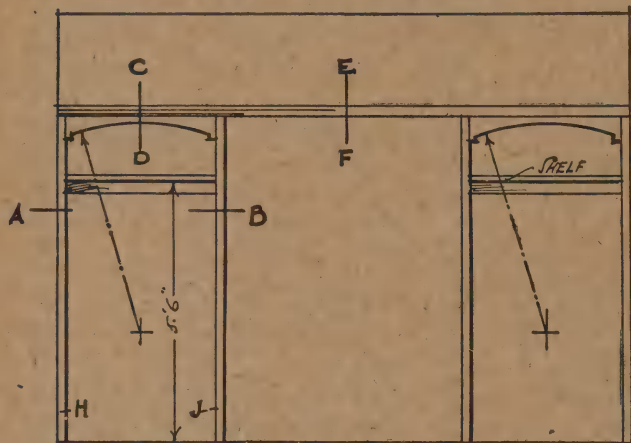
Front Elevation of Open-fronted Cupboards and Central Recess
